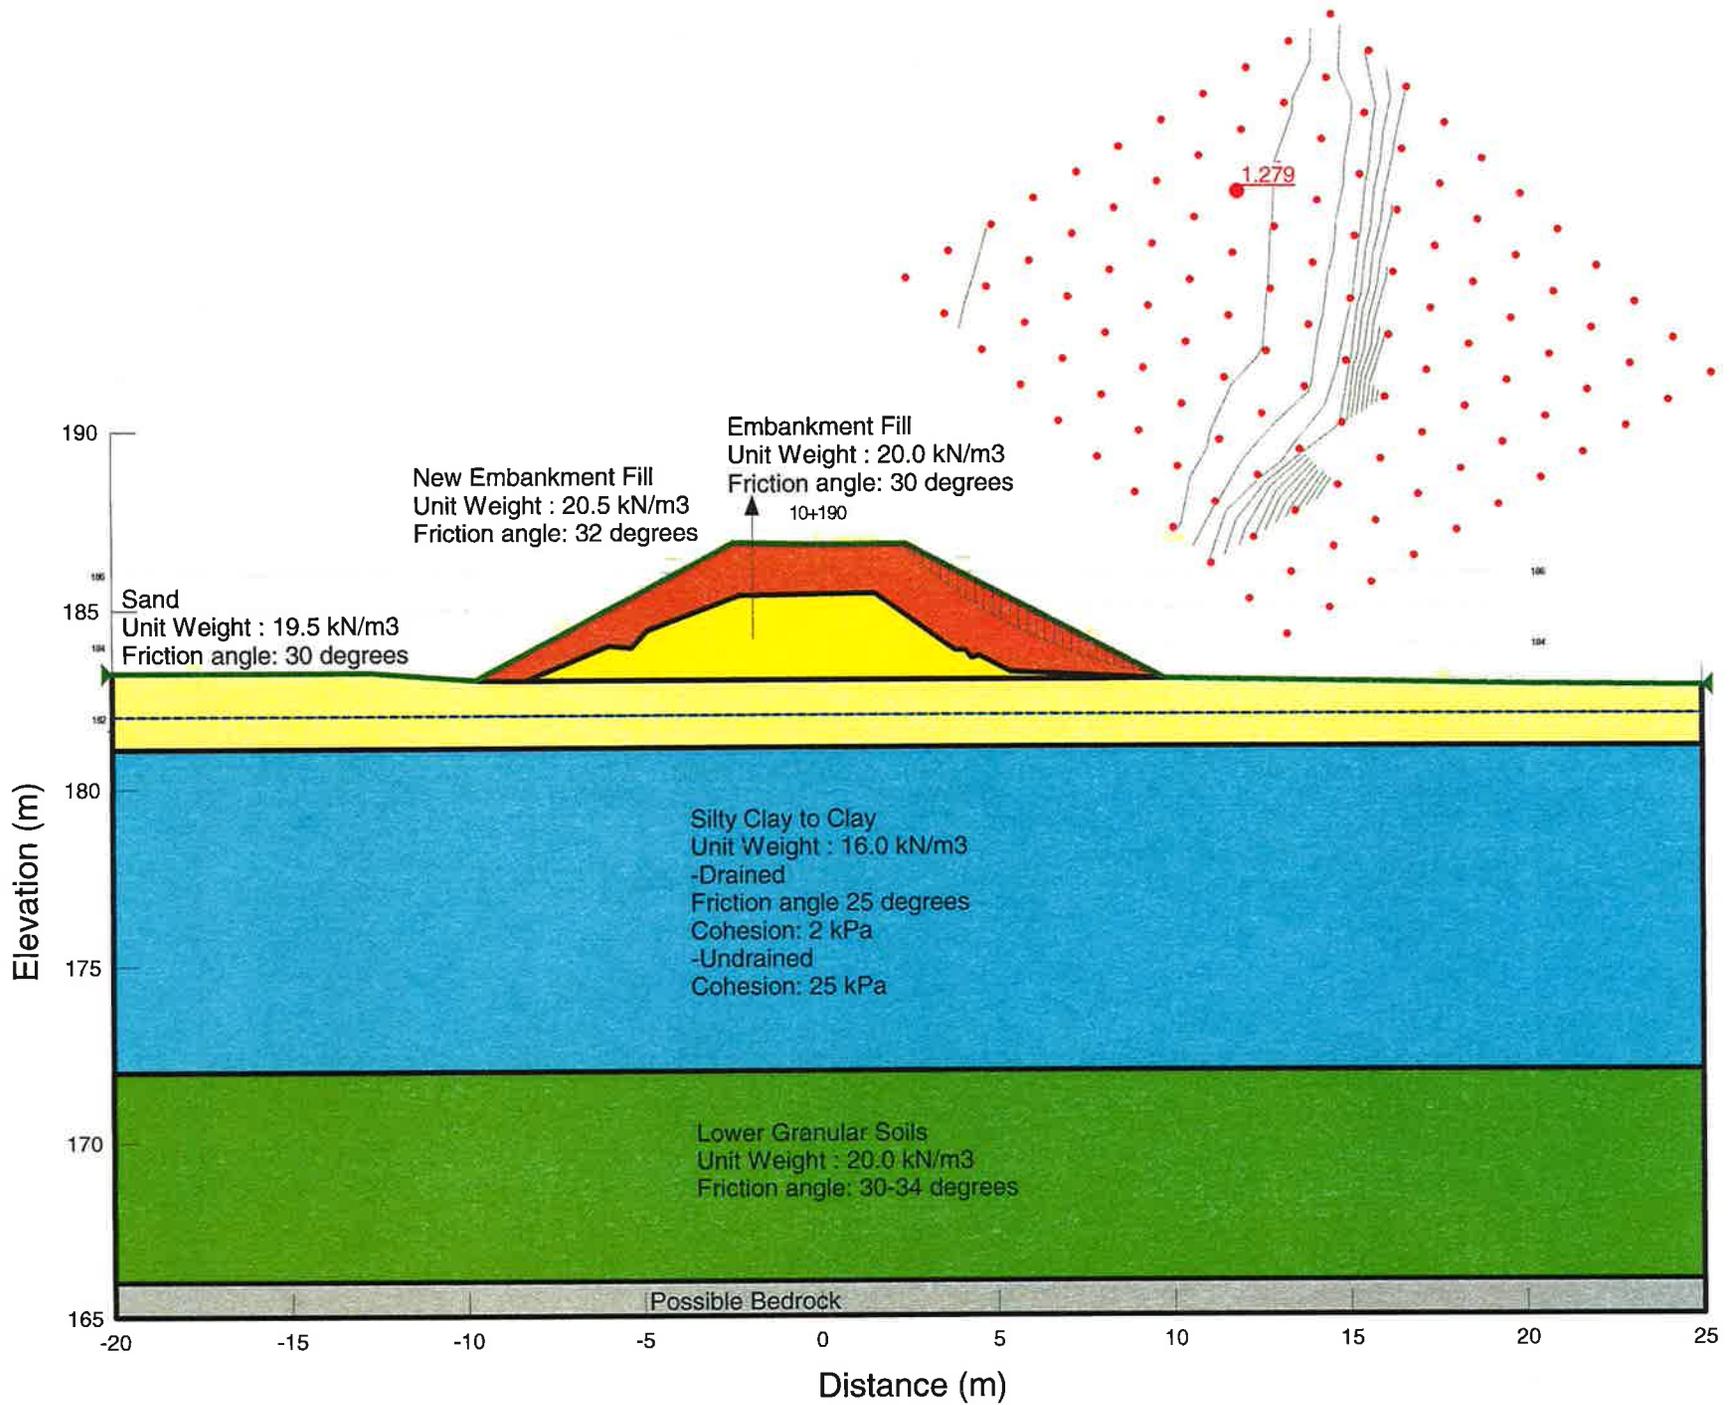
Stability analysis @ STA. 10+190 with 1.0 m surcharge (north abutment location)
